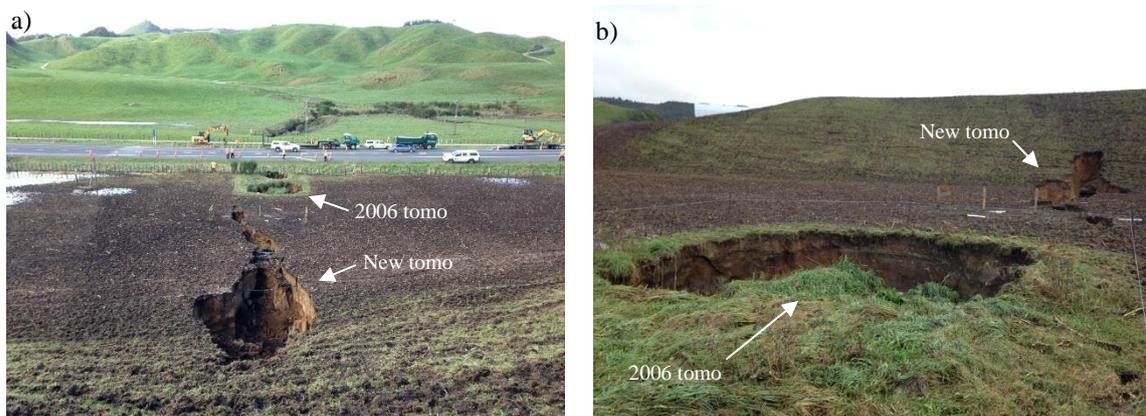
Sinkholes/tomos developed in the adjacent properties. a) Looking east from the hill towards the road. b) Looking west from the road towards the hill.
